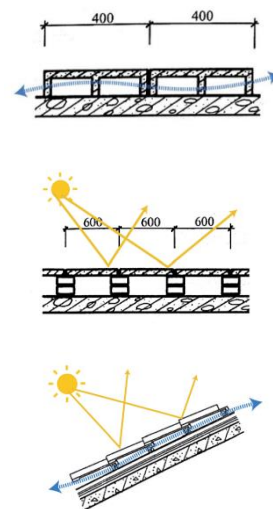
Interlayer for ventilation of terrace roof and pitched roof
